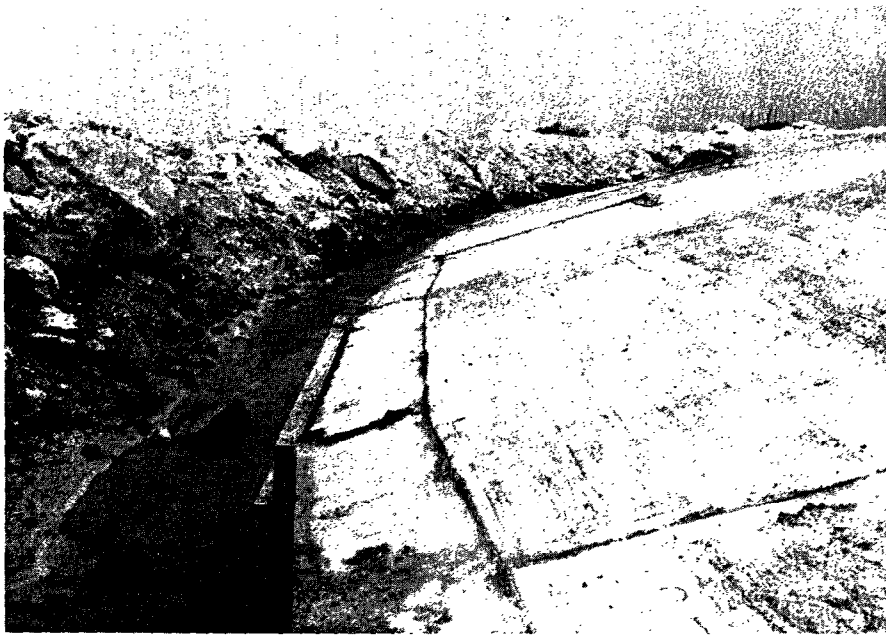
KEYWALL EXPANSION JOINT.
